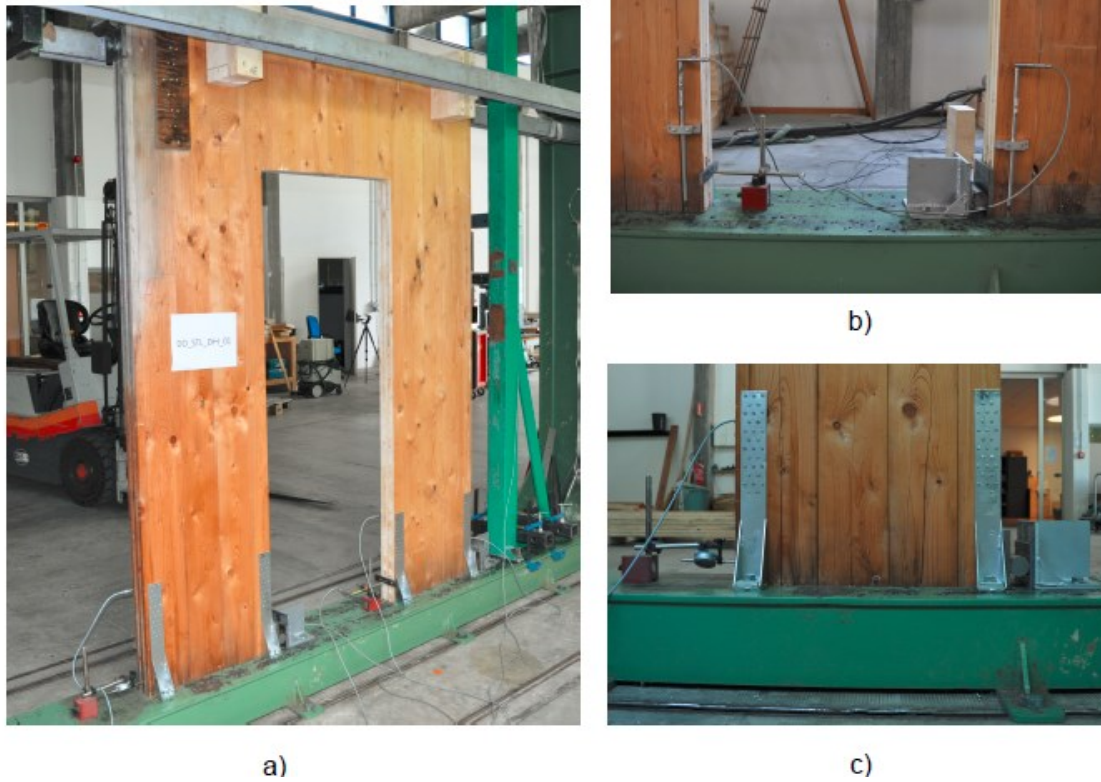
Geometric configuration, connection system and monitored displacements of shearwall 02, a) picture of the wall, b) LVDTs placed at the two inner extremities of right and left wall segments and c) zoom in of WHT440 hold-downs connection at the right wall segment of the wall
